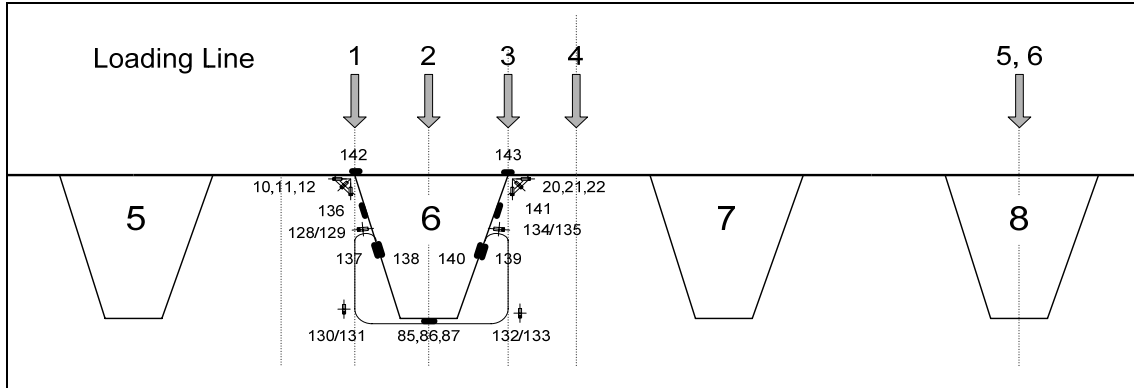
Gage Location and Loading Lines, Rib 6 at Diaphragm B
